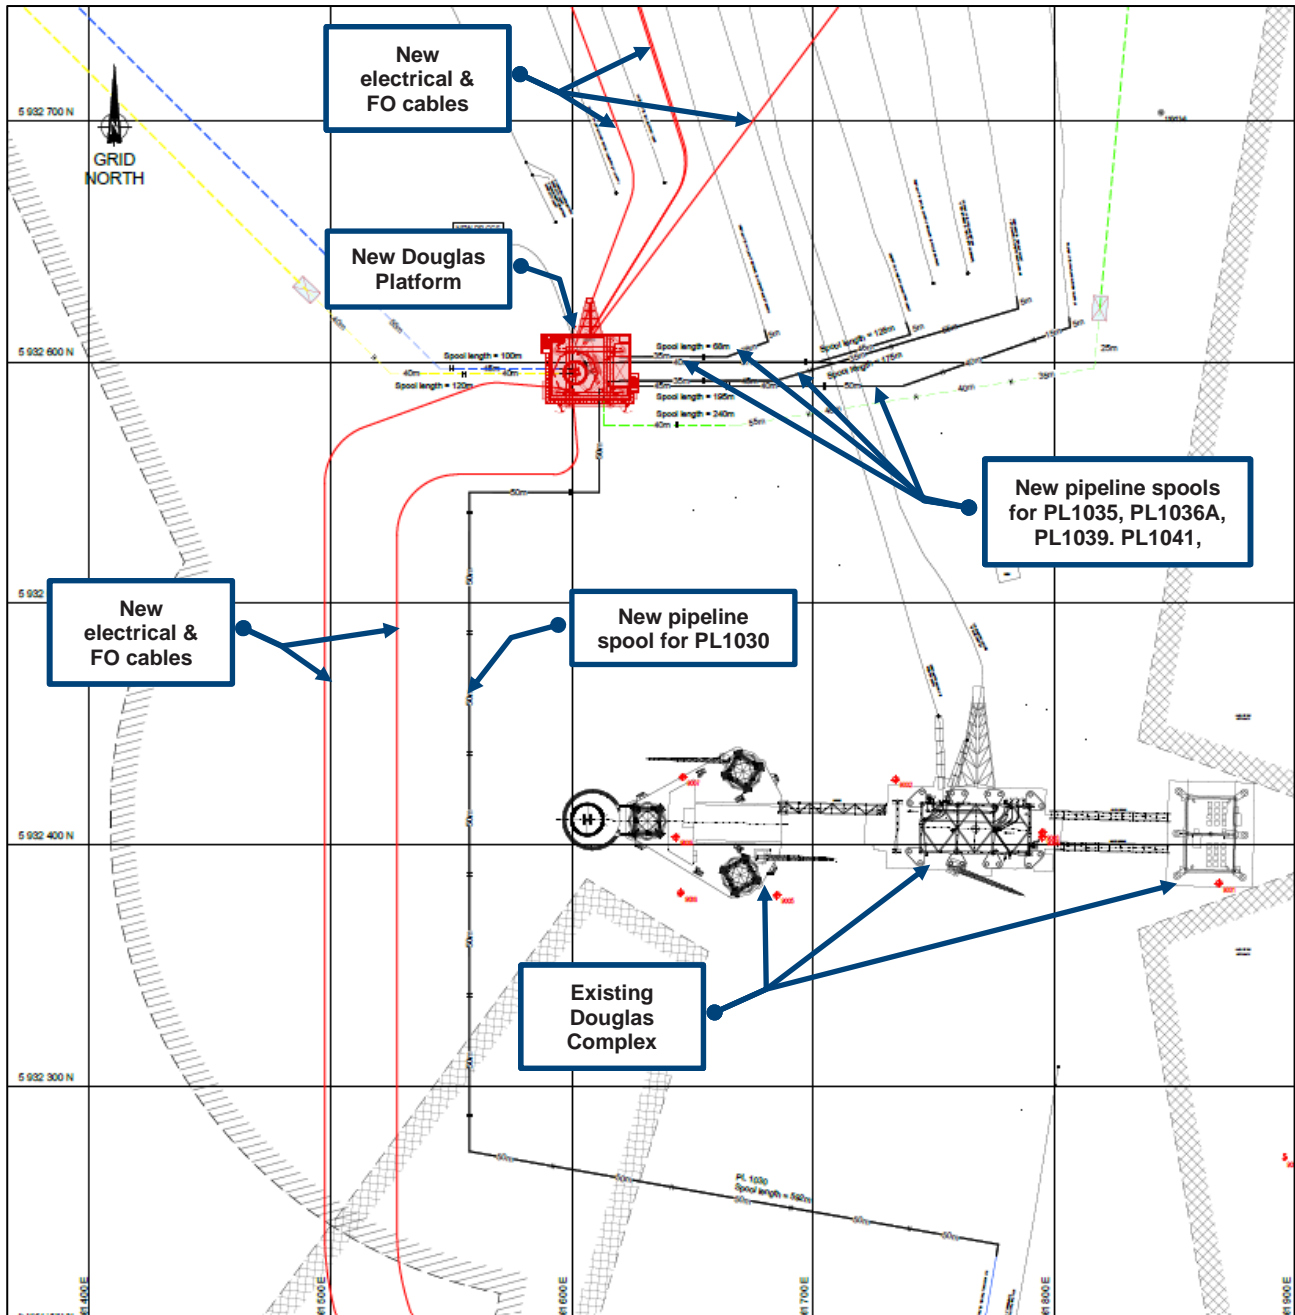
Location of New Douglas CCS platform and existing Douglas complex, and existing gas pipelines connections to New Douglas
